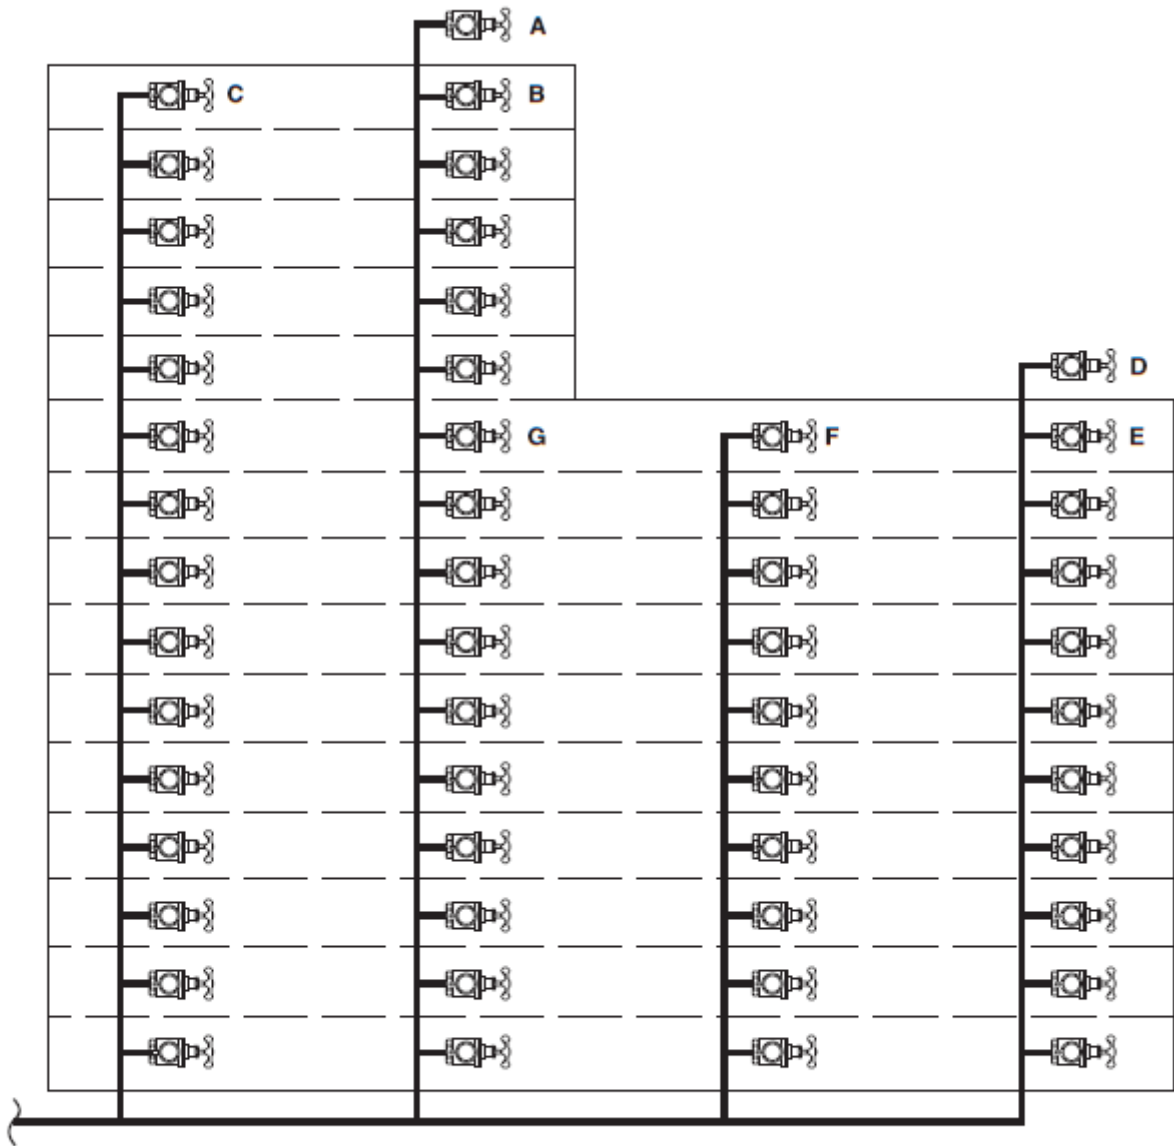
Standpipe System with Risers Terminating at Different Floor Levels.
